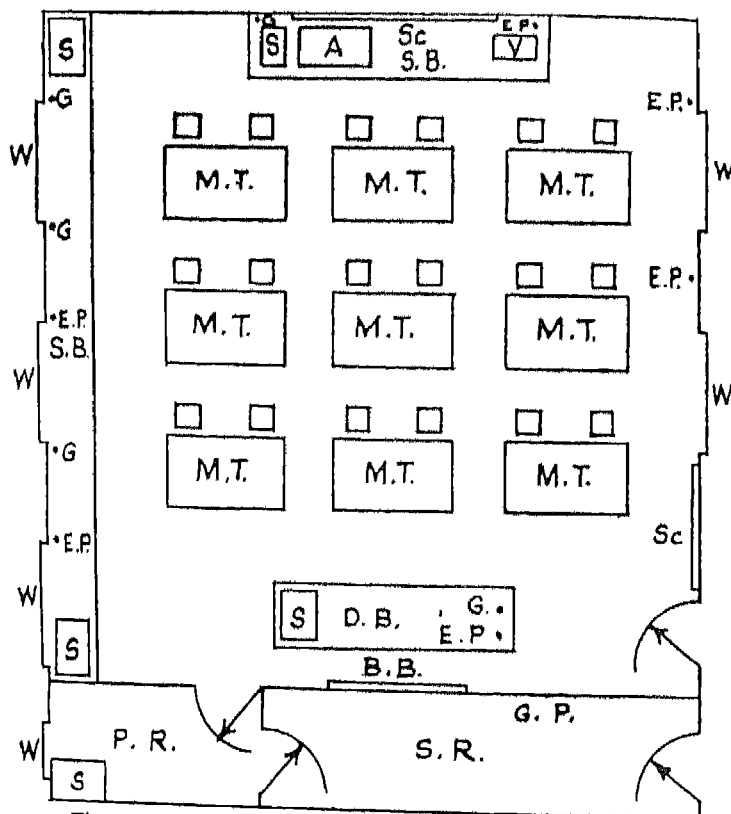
Plan of Biology Laboratory (Scale : $\frac{1}{8}$ in. = 1 foot)
